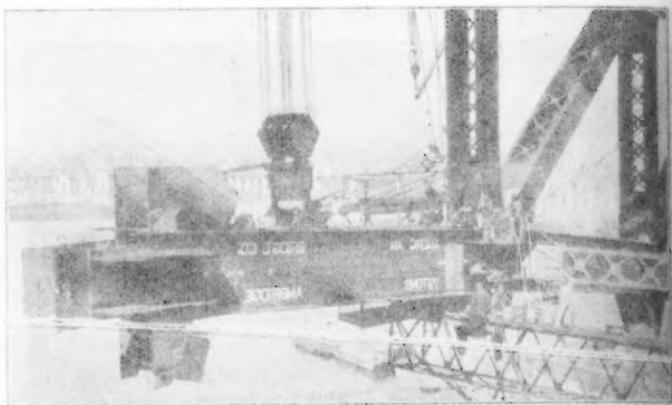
CONNECTING BOTTOM CHORD MEMBER, HILL GATE BRIDGE.
